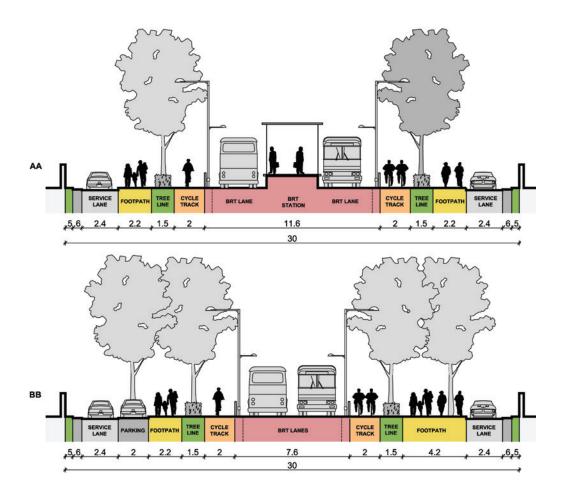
A 30m right-of-way can accommodate BRT along with pedestrian footpaths, cycle tracks, on-street parking, and a local street carriageway. In order to accommodate the BRT station, the parking lanes are discontinued.
